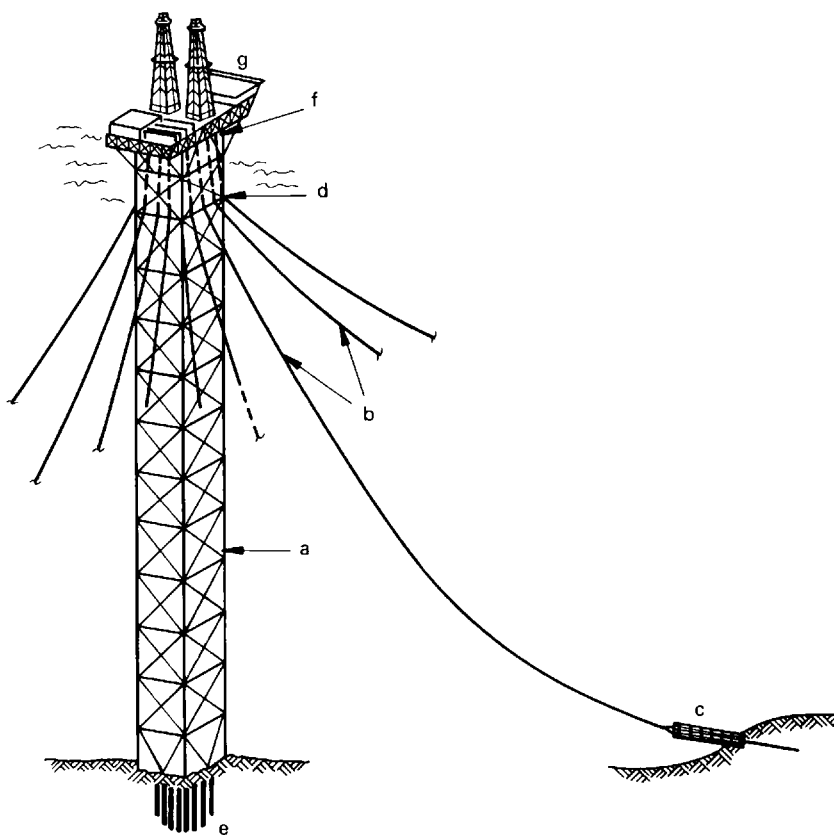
Typical guyed tower. Key: a – tower; b – guylines; c – clump weight; d – fairleads; e – foundation; f – guyline terminations; g – platform deck
